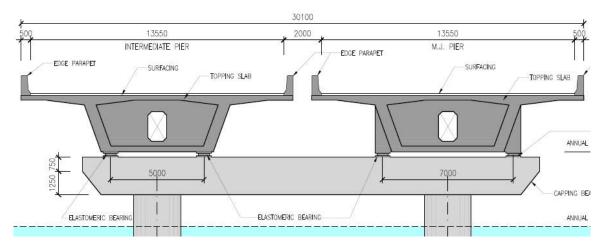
Typical Section of Lake Viaduct with Box Girder
